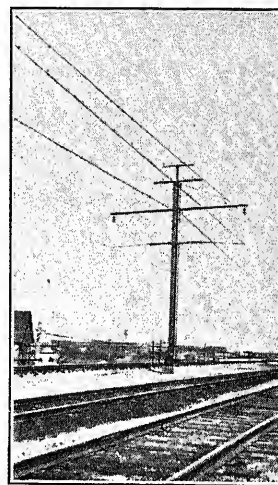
TYPICAL 2-TRACK BRACKET CONSTRUCTION
